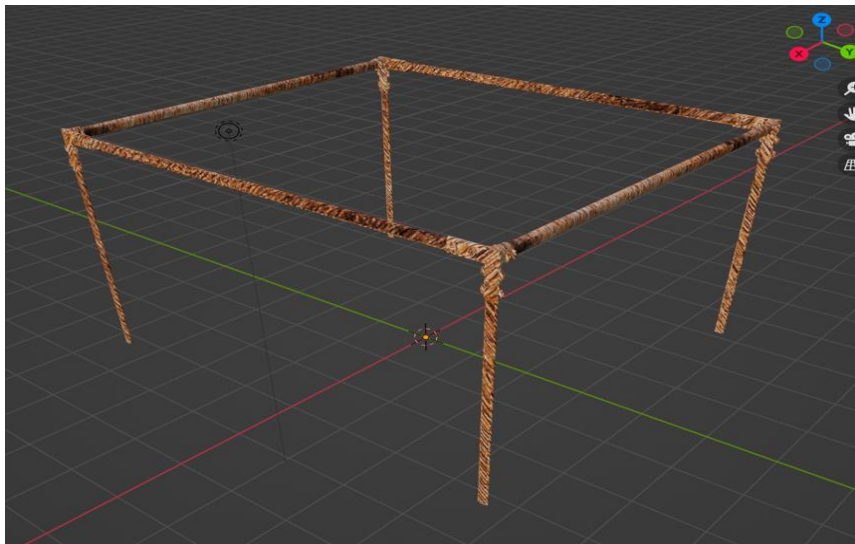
Frame design for the Agri-PV plant in Bolzano.
